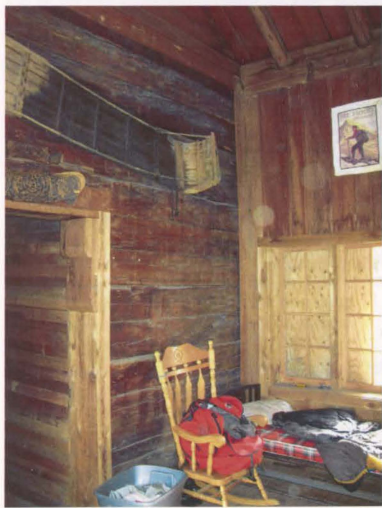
Interior walls in the central hall feature original wall logs that contain historic craft tooling marks from the broadaxe and adz. Note wood trim on doorway to east wing and vertical wall boards on the south wall. View facing SE
